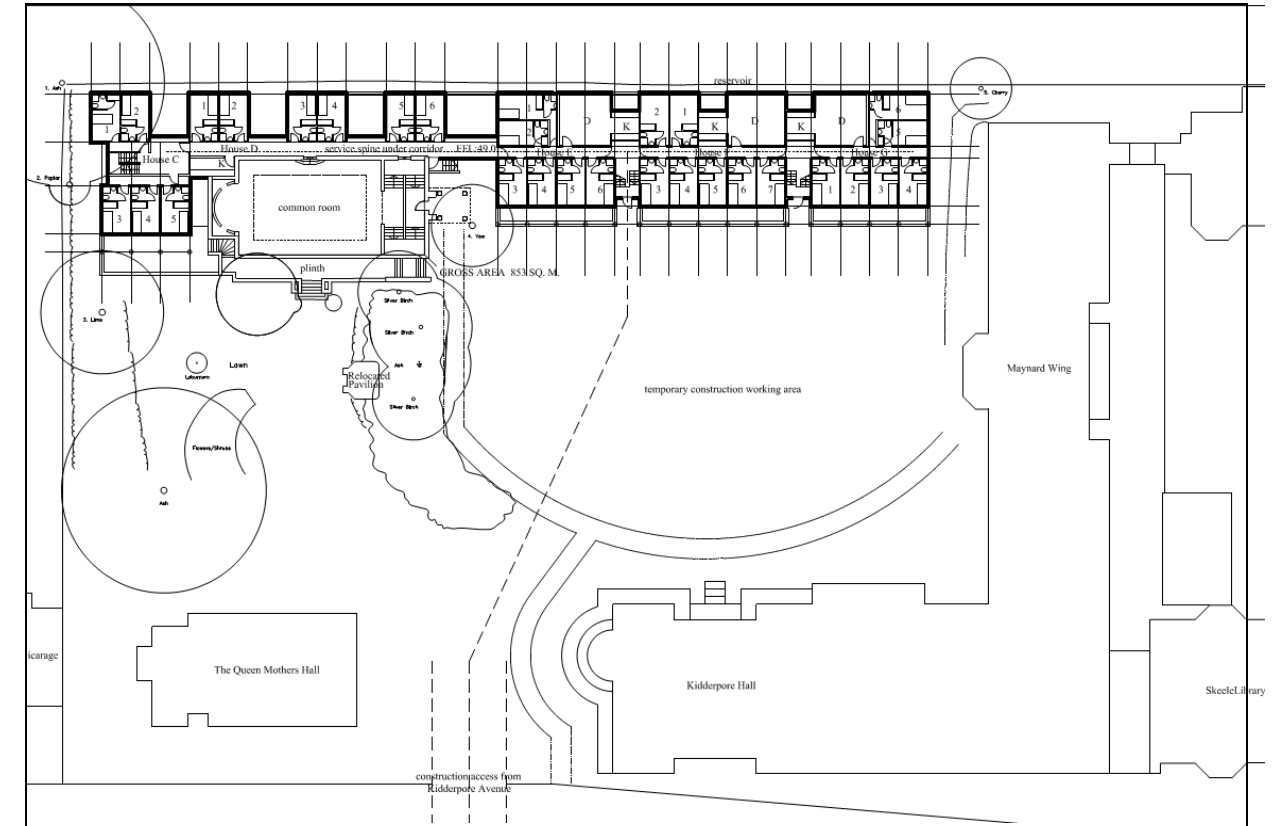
The approved General Arrangement drawing showing the proposed upper ground floor plan of the 1997 Appeal scheme.
